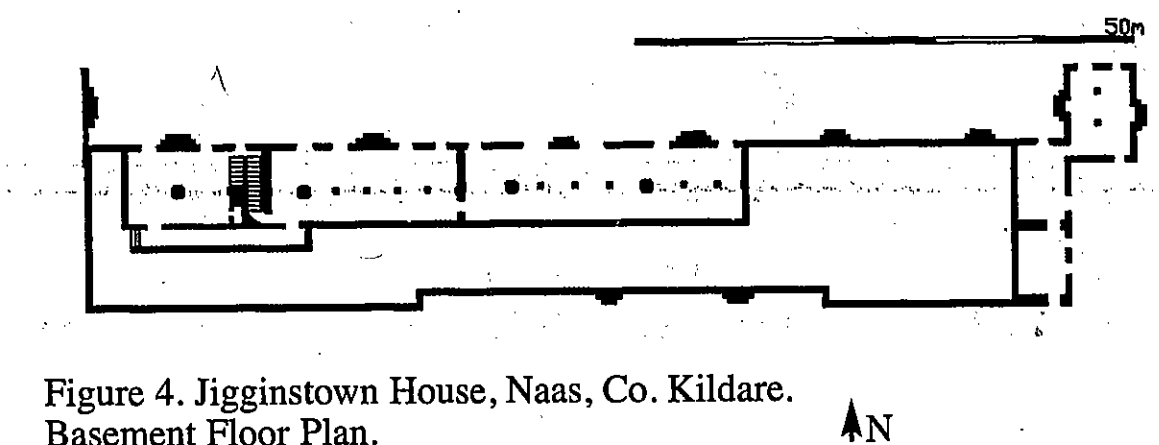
Jigginstown House, Naas, Co. Kildare. Basement Floor Plan.
